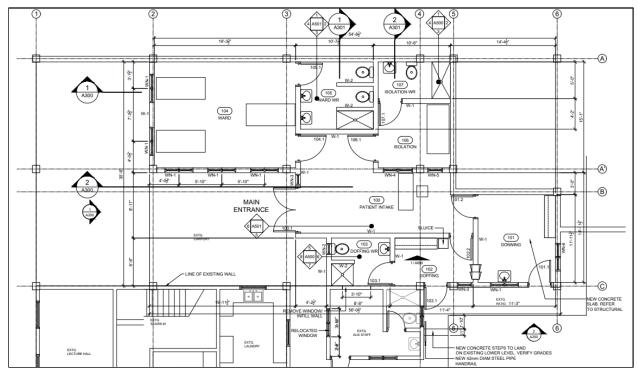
Renovated Carport Level Floor Plan for Isolation Facility at the Buccament Polyclinic
